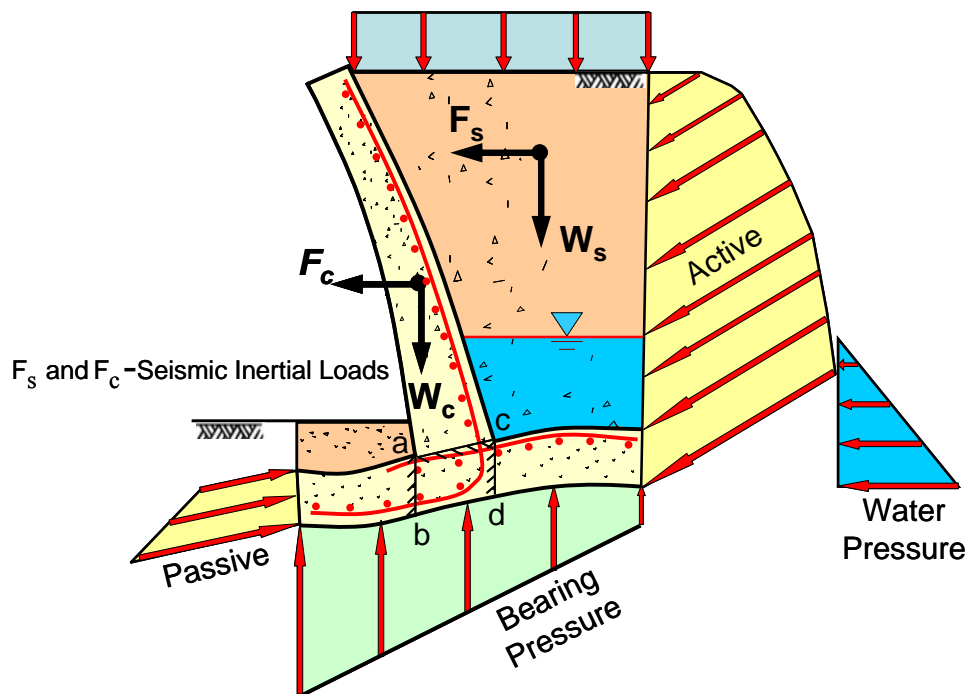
Combined Thrust Loads and Deformed Shape of Cantilever Wall
